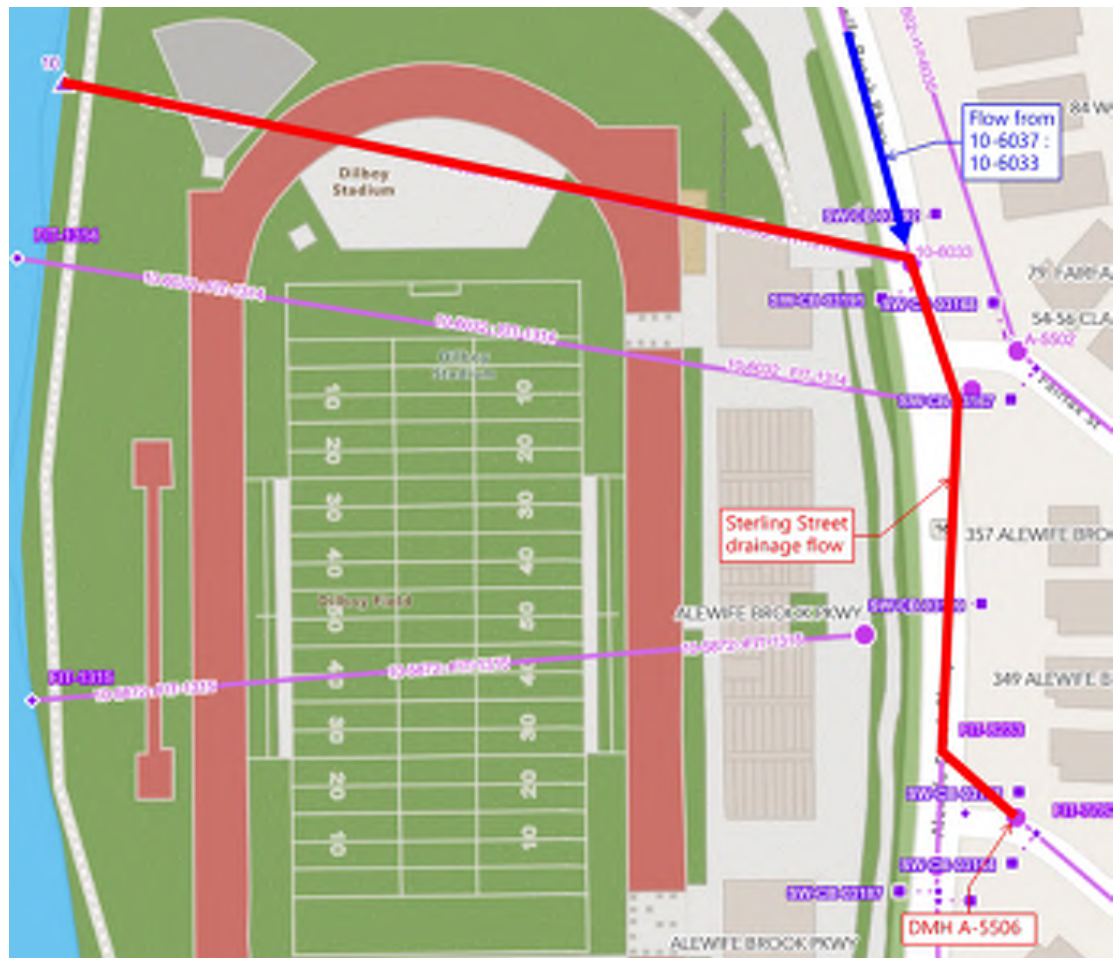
CONFIRMED STERLING STREET DRAINAGE CONFIGURATION
